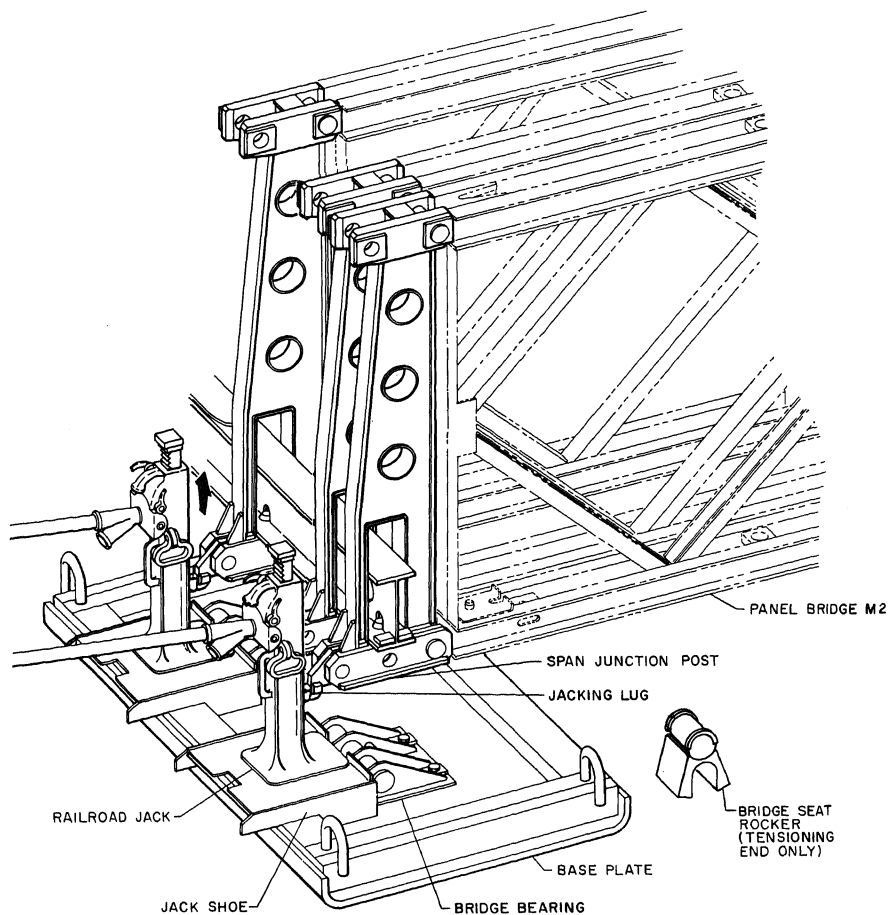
Jacking up end of M2 panel bridge to install cable connection beam.
